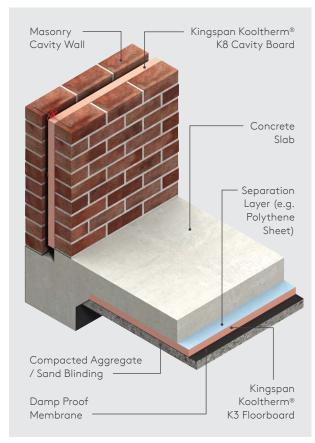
Solid residential concrete slab on ground floor with Kooltherm® K3 Floorboard below the floor slab.
